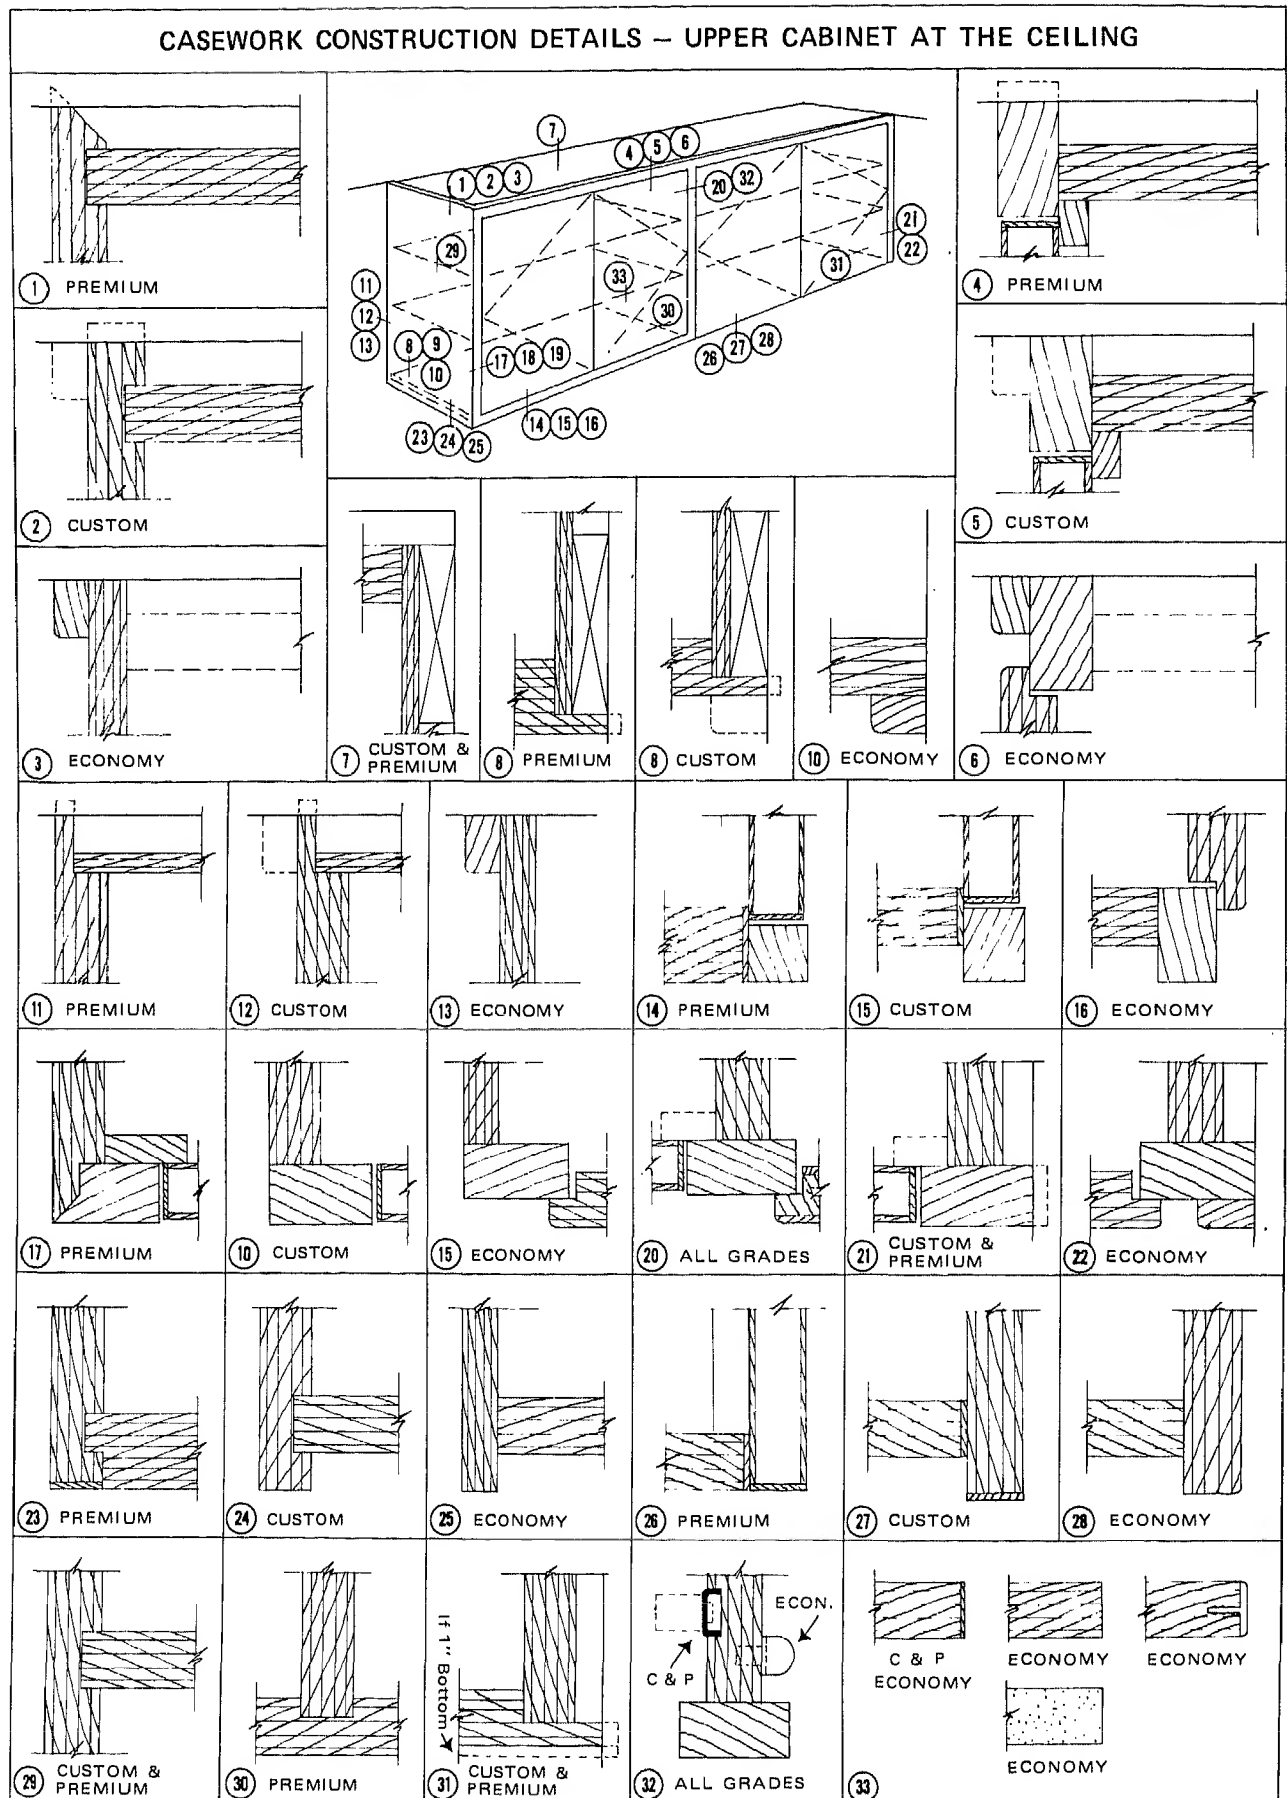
Casework construction details – upper cabinets at the ceiling.
